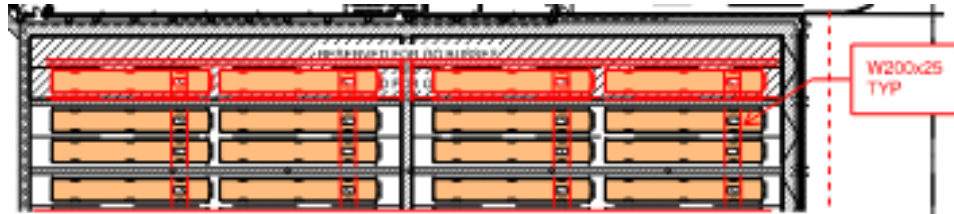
Roof Framing Plan – Structural Support for Interior Pantographs.
